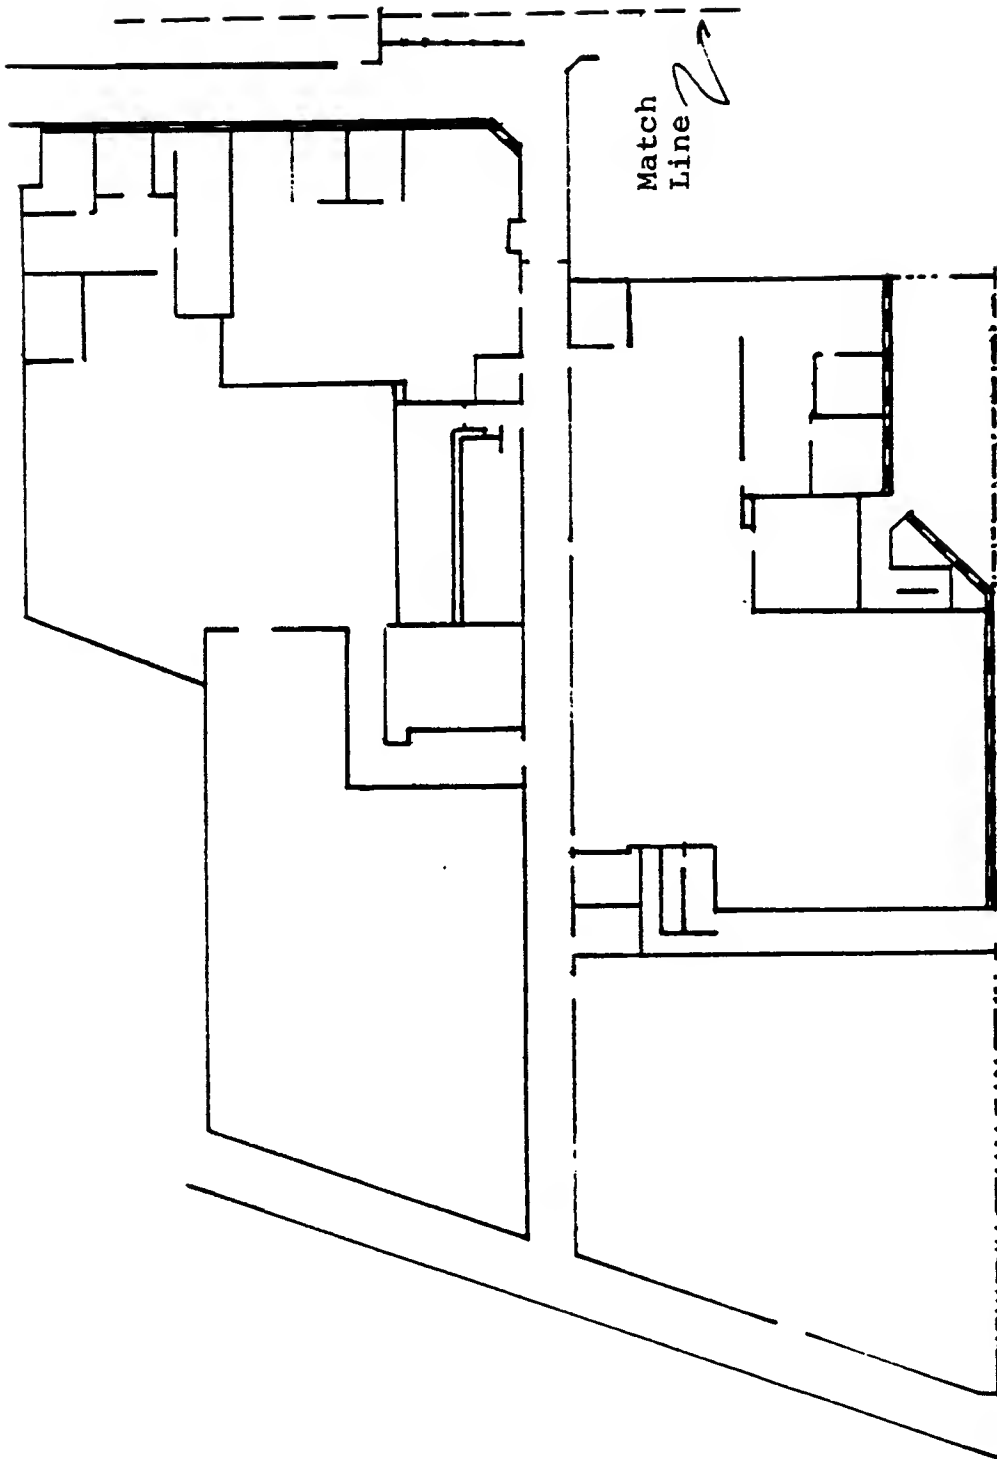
USIA BUILDING FIRST FLOOR-SOUTH
